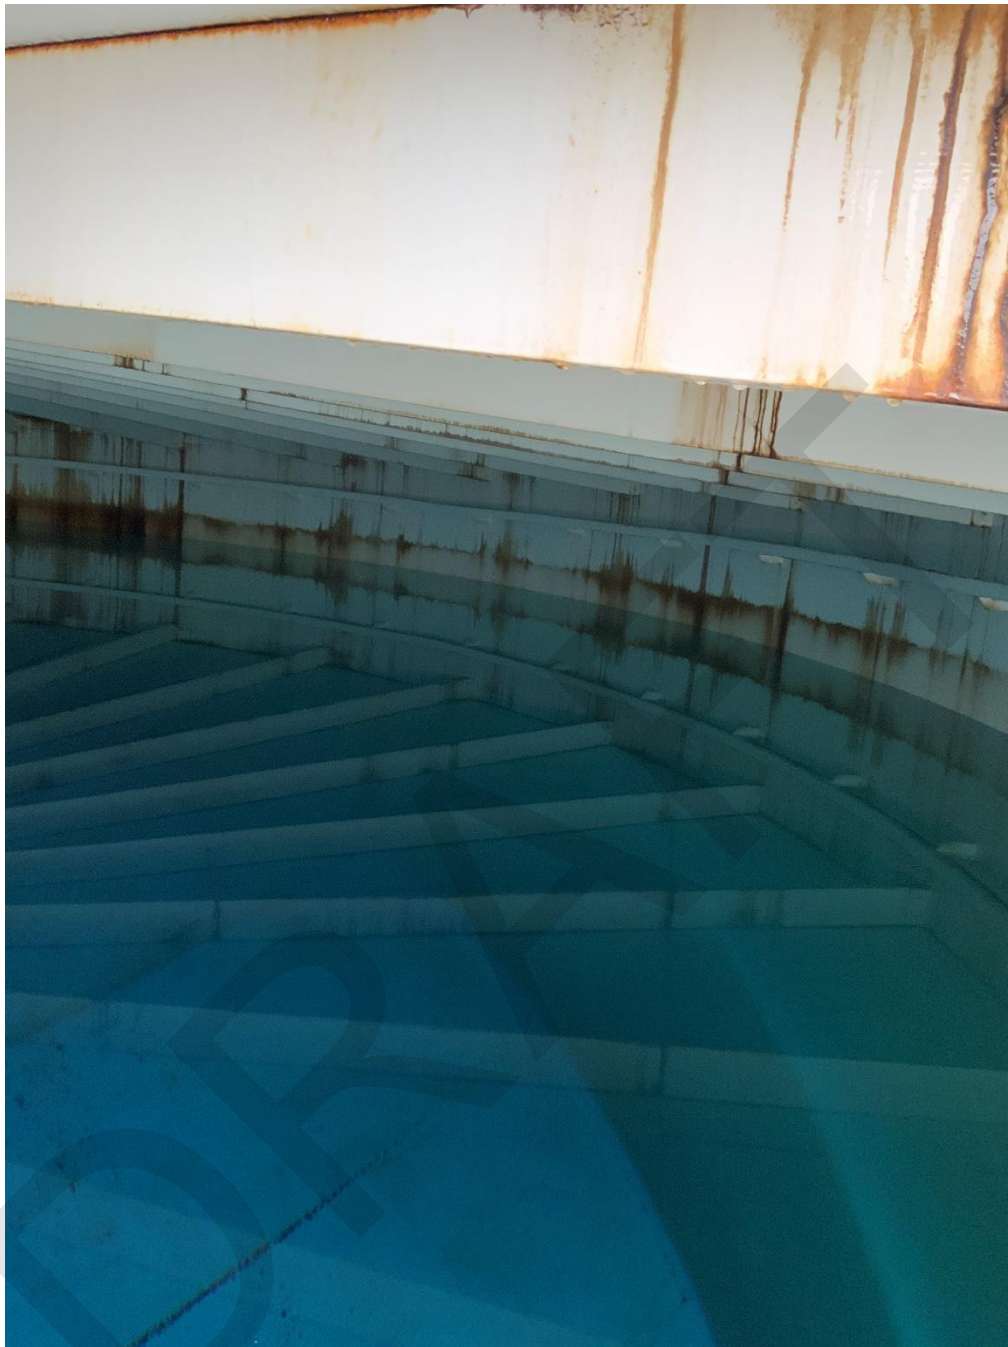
Tank Interior Roof Framing Corrosion
